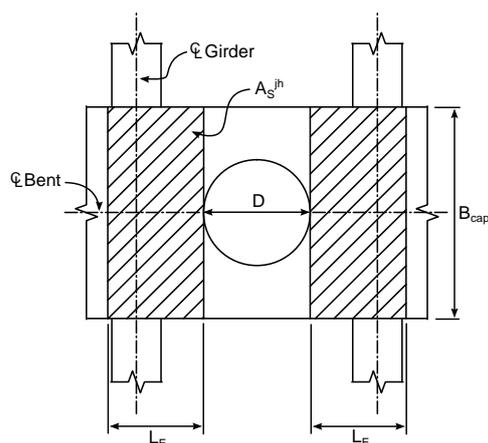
Location of Horizontal Reinforcing
